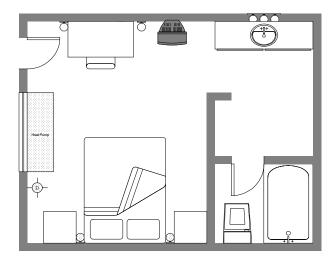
Floor Plan of Typical Guest Room with Furniture Arrangement
